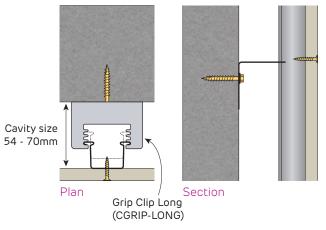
Grip Clip LongWith 6.5mm hole suitable for Hex head screws
